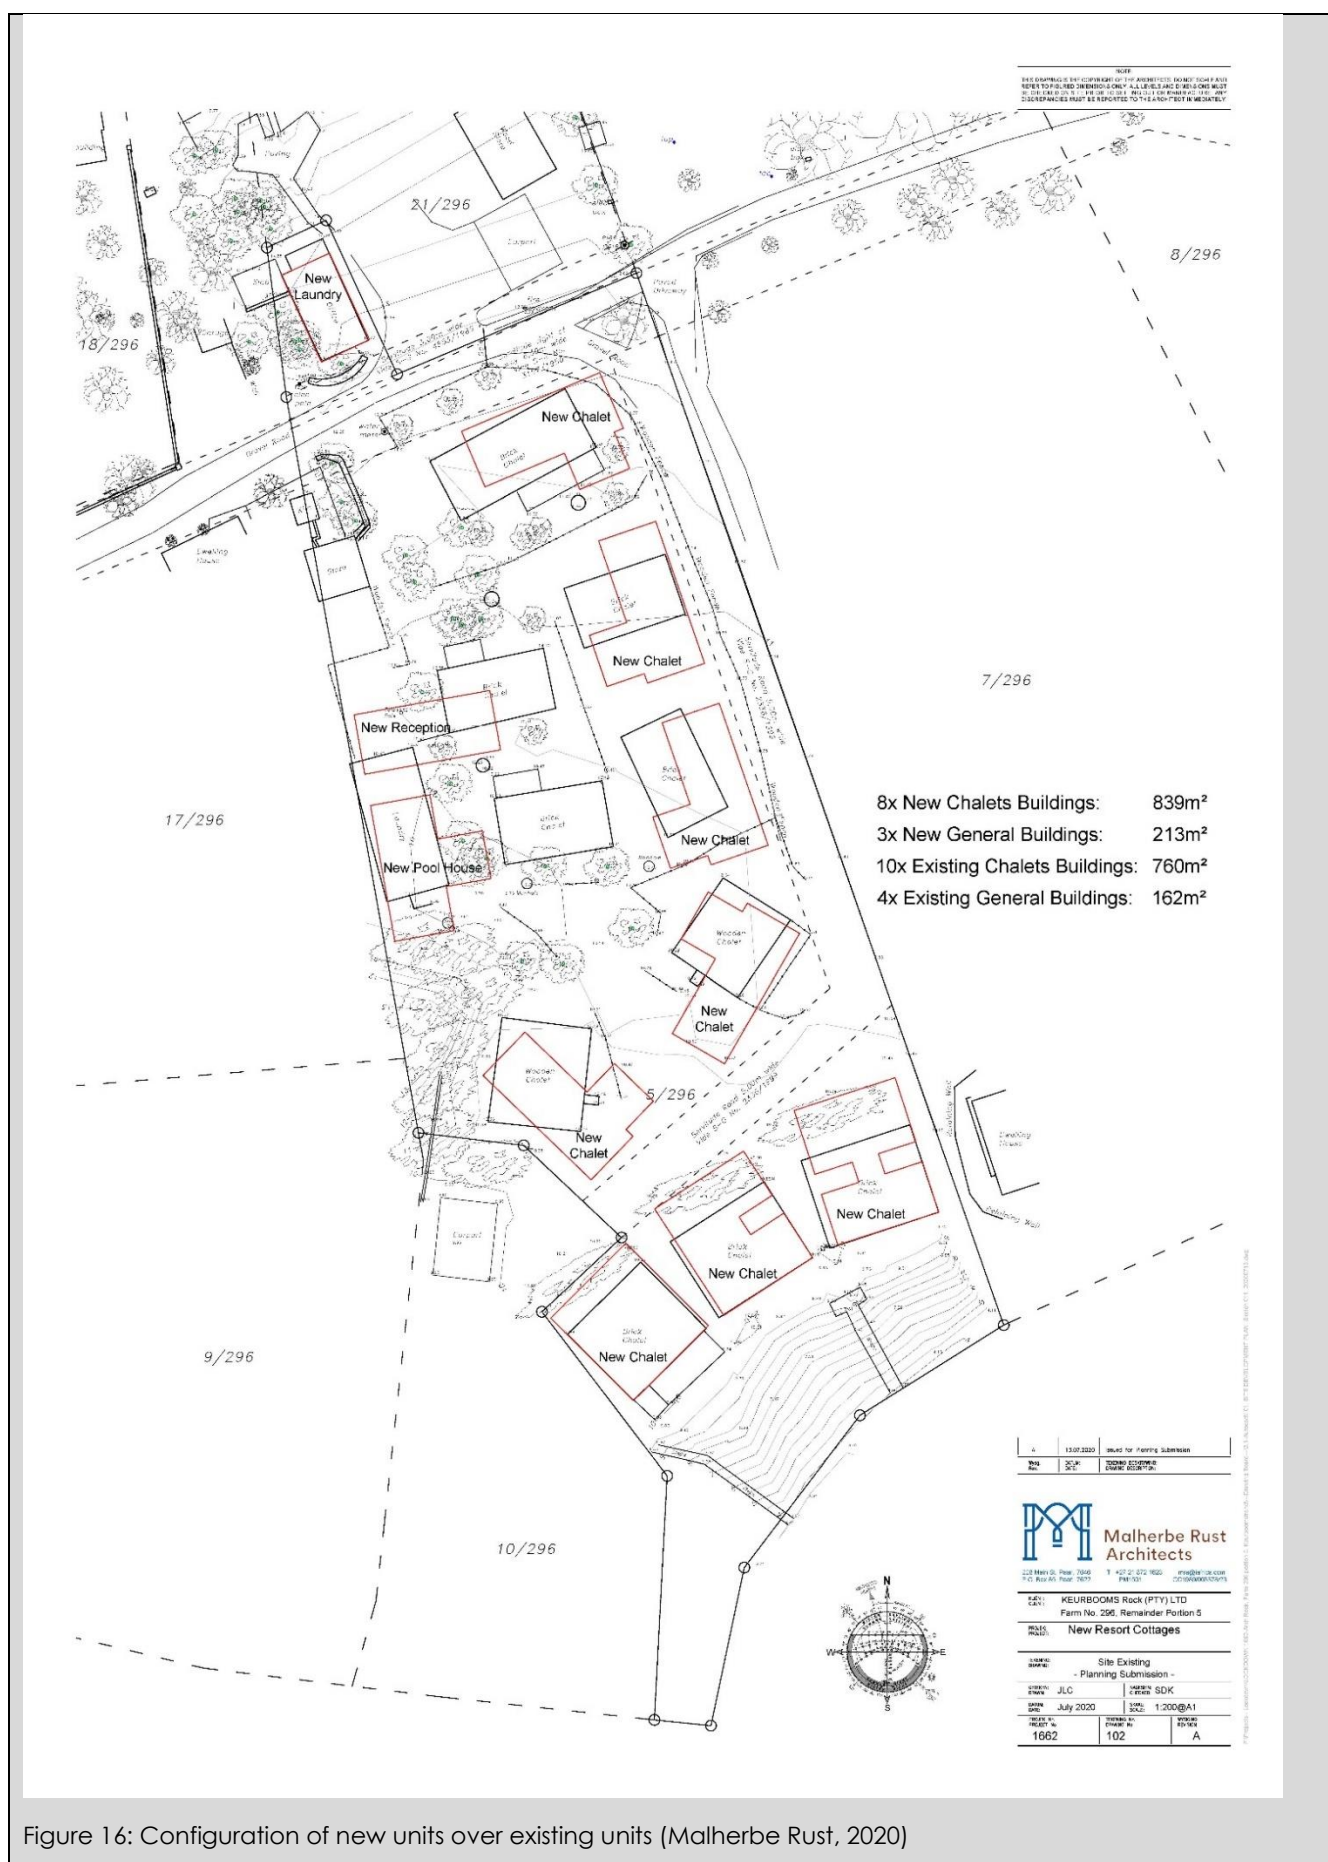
Configuration of new units over existing units (Malherbe Rust, 2020)
